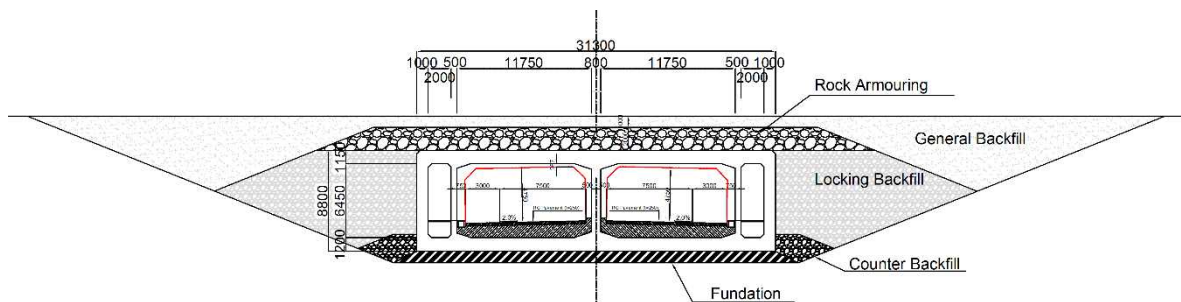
Cross Section of Nguyen Trai Tunnel
